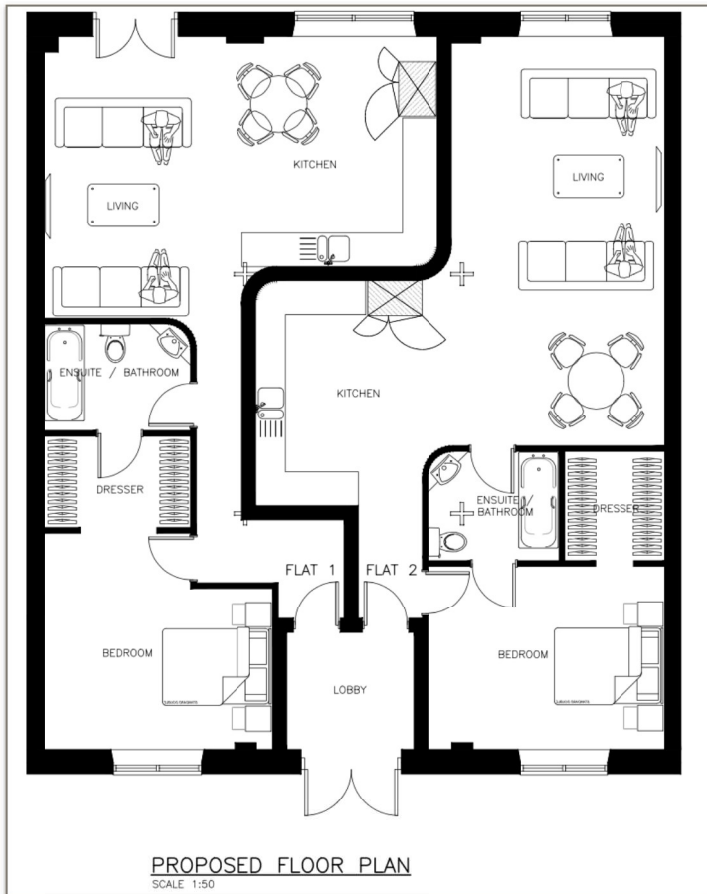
PROPOSED GROUND FLOOR PLAN
